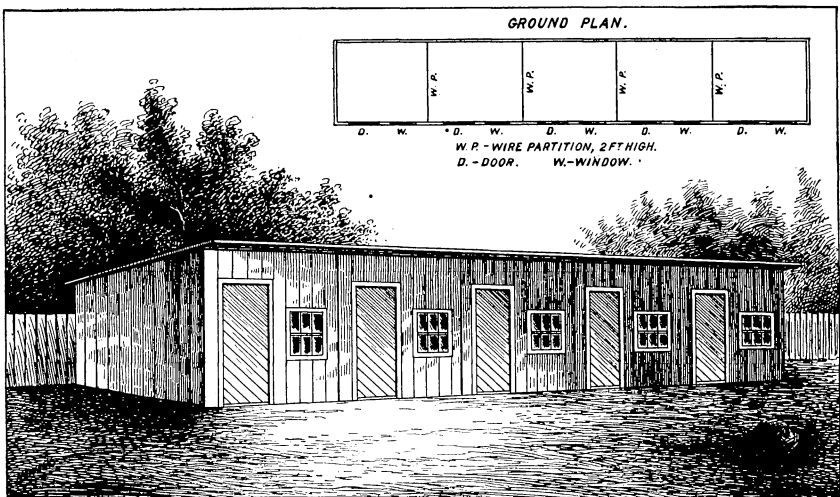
Plan and ground plan of five-pen breeding house for ducks.
